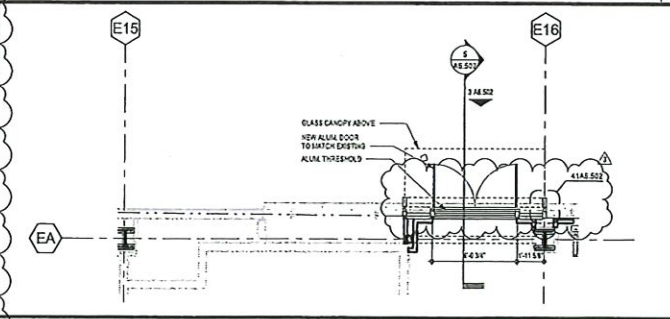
DETAIL - MASON ST CANOPY 1 1/2" = 1'-0" 25
